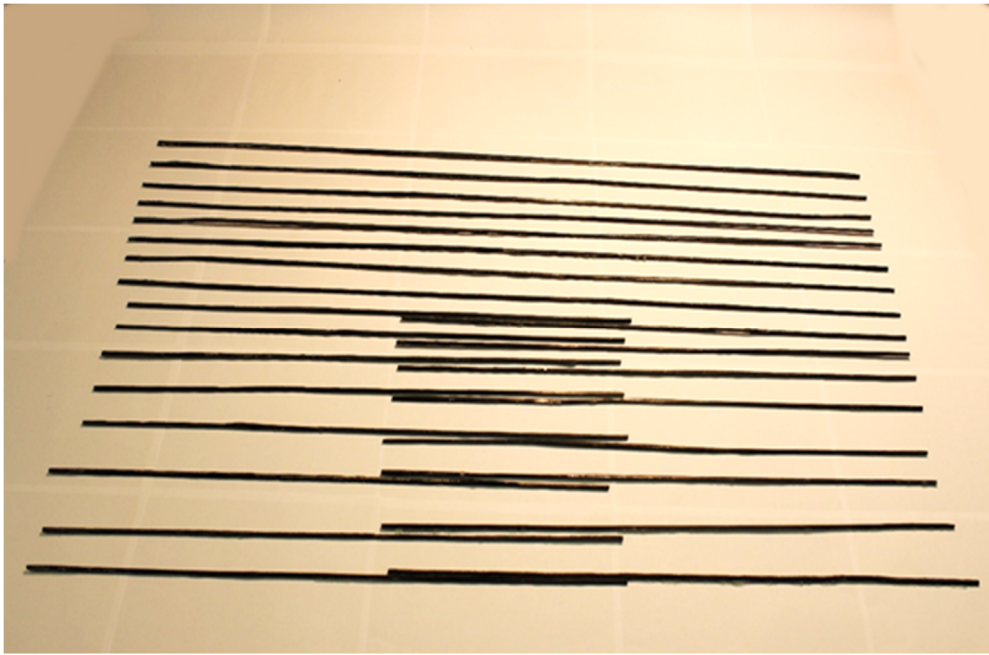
Uncoated CFRP straight bars for beam specimens C and D.
